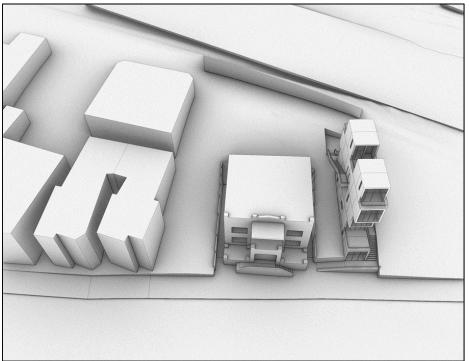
Rendering showing the existing unit four unit building to the left of the proposed five unit building
